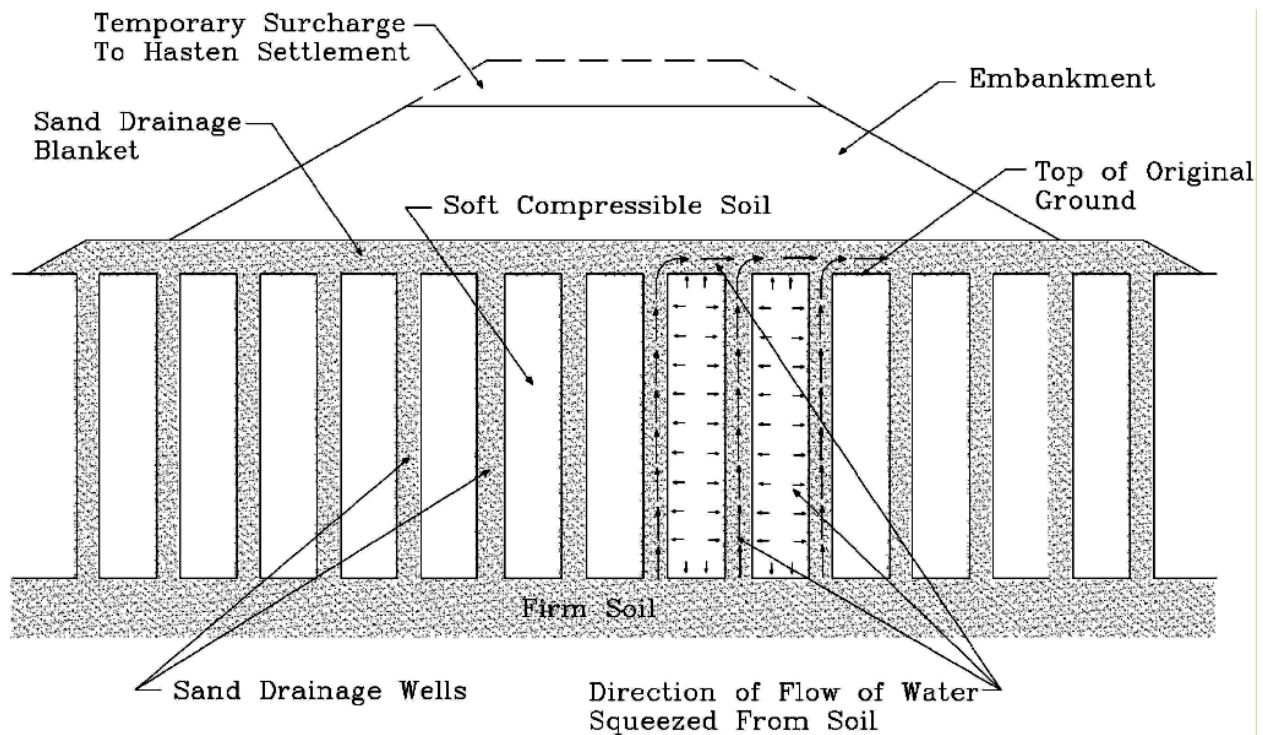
A typical sand drainage well installation (redrawn from Moulton, 1980).
